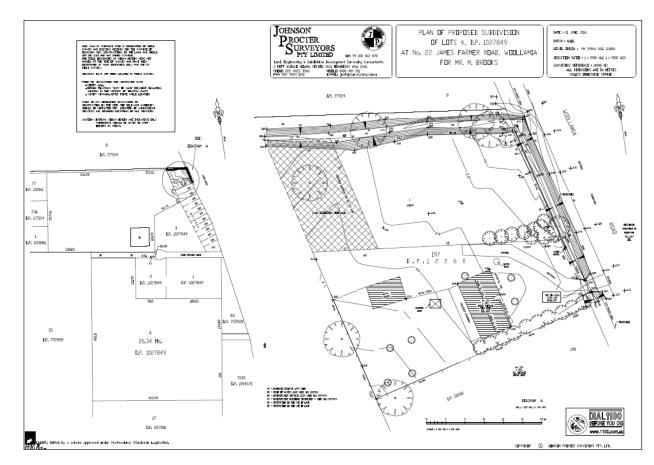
Proposed Subdivision (Refer also to separate attachment for greater detail)
